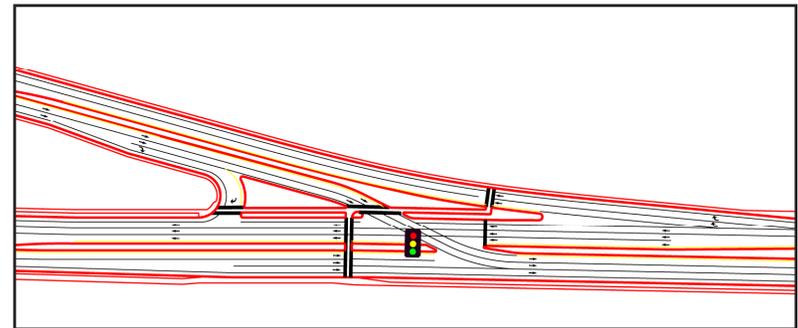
WORKING GROUP ALTERNATIVE BETWEEN DOWELL ROAD AND FAIRGROUNDS ROAD
